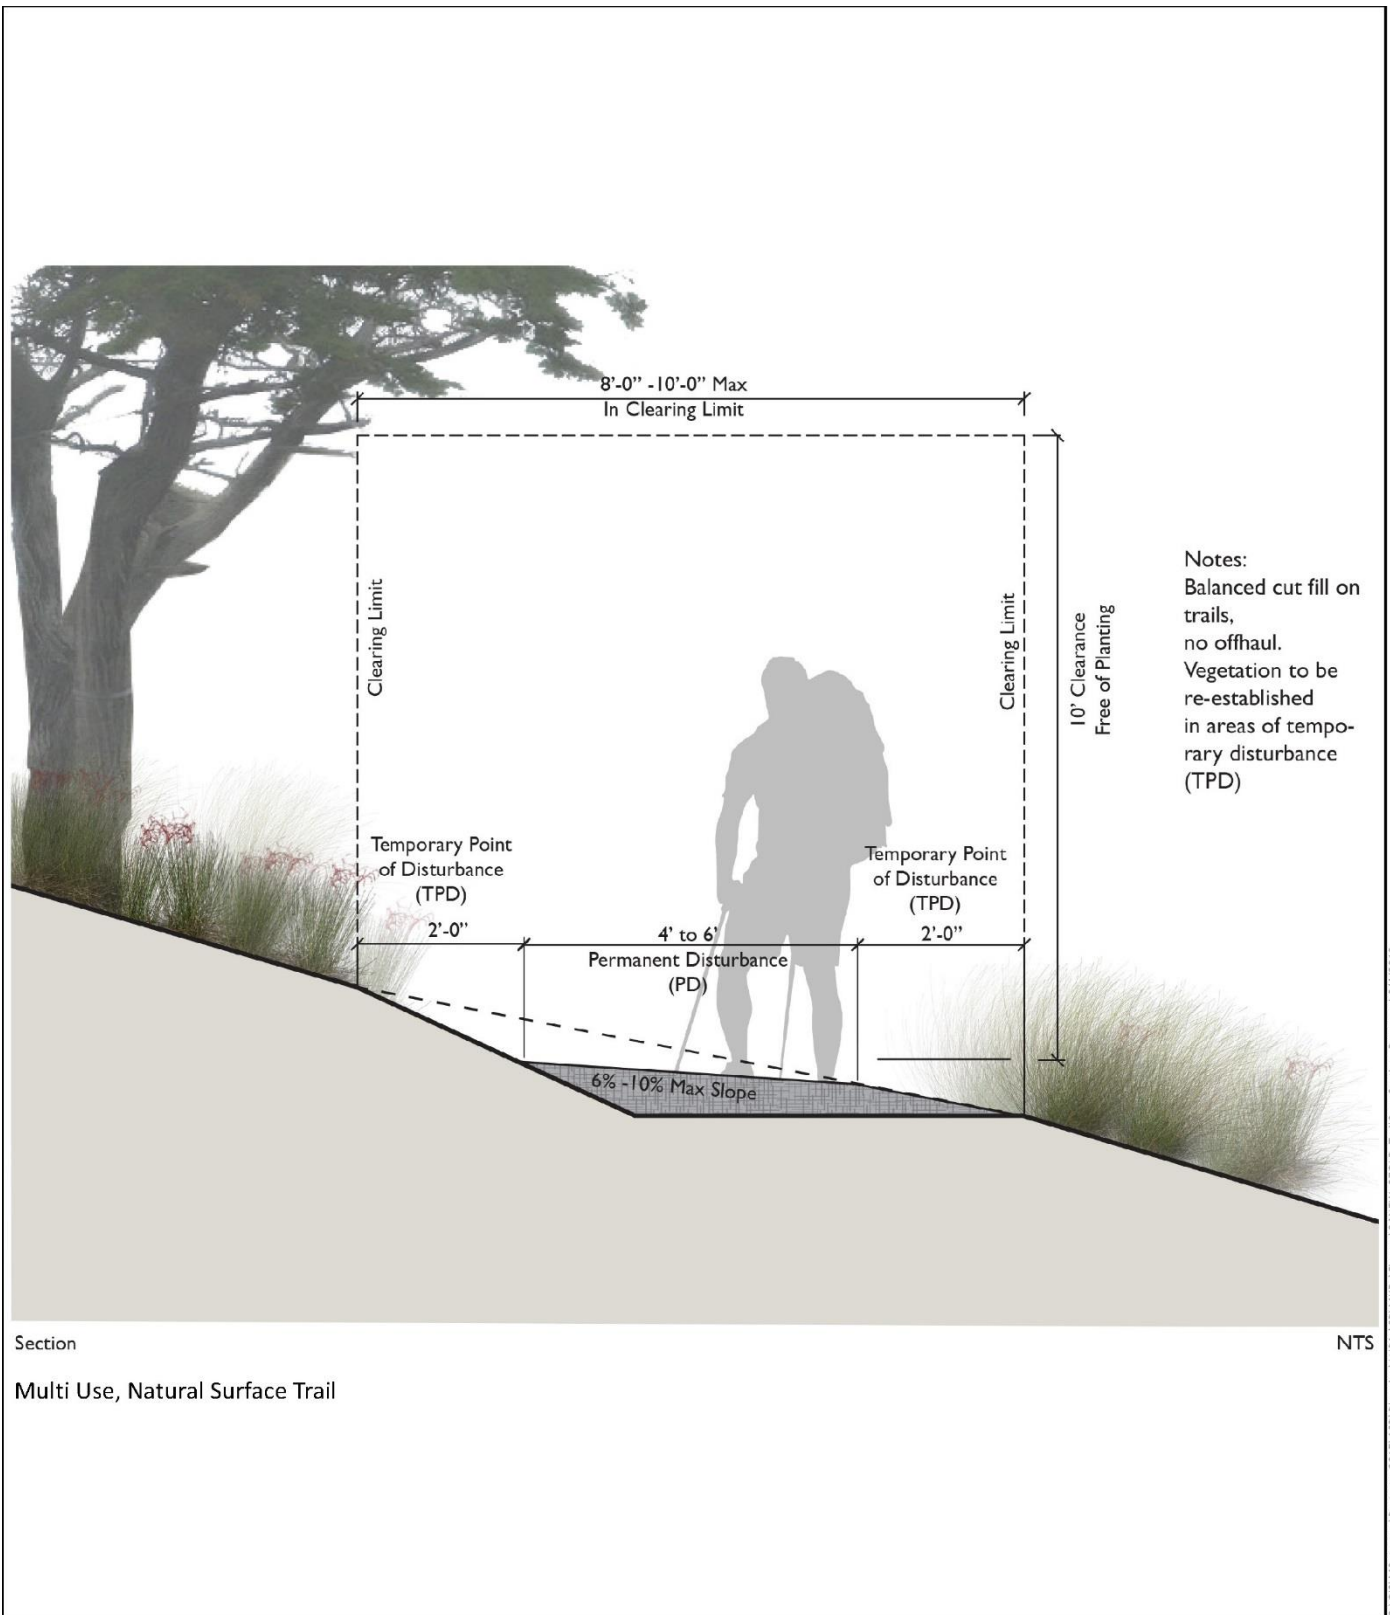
TYPICAL TRAIL CROSS SECTION
